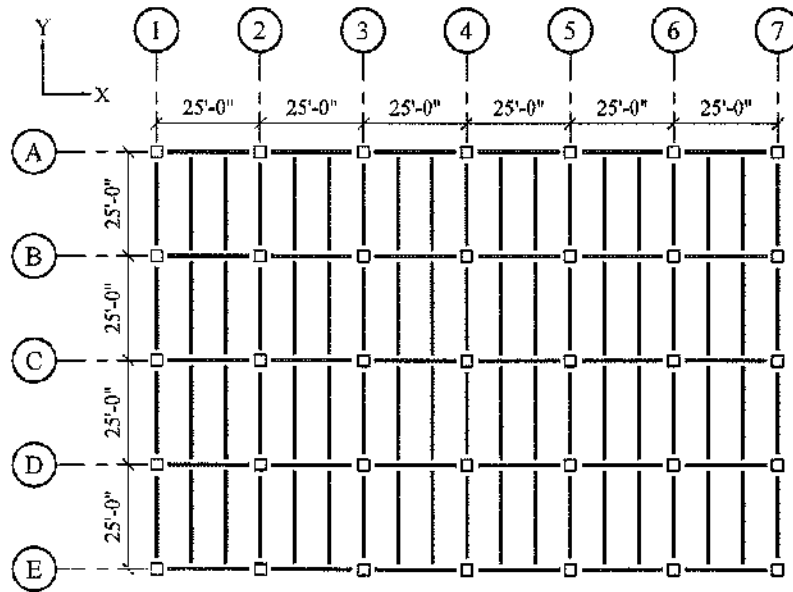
Typical floor framing plan (1.0 ft = 0.3048 m)
